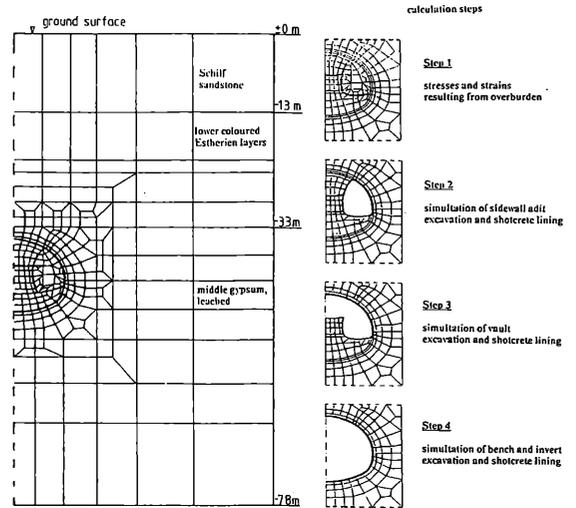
Road tunnel Stuttgart-Heslach II, FE mesh, WITTKÉ (1987)
